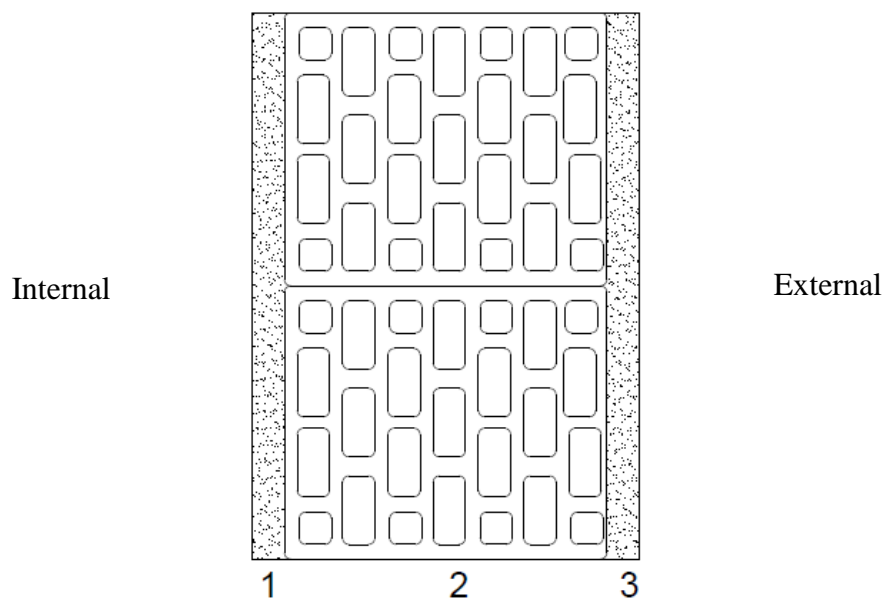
Typical topology detail of a wall with thermal insulation bricks
